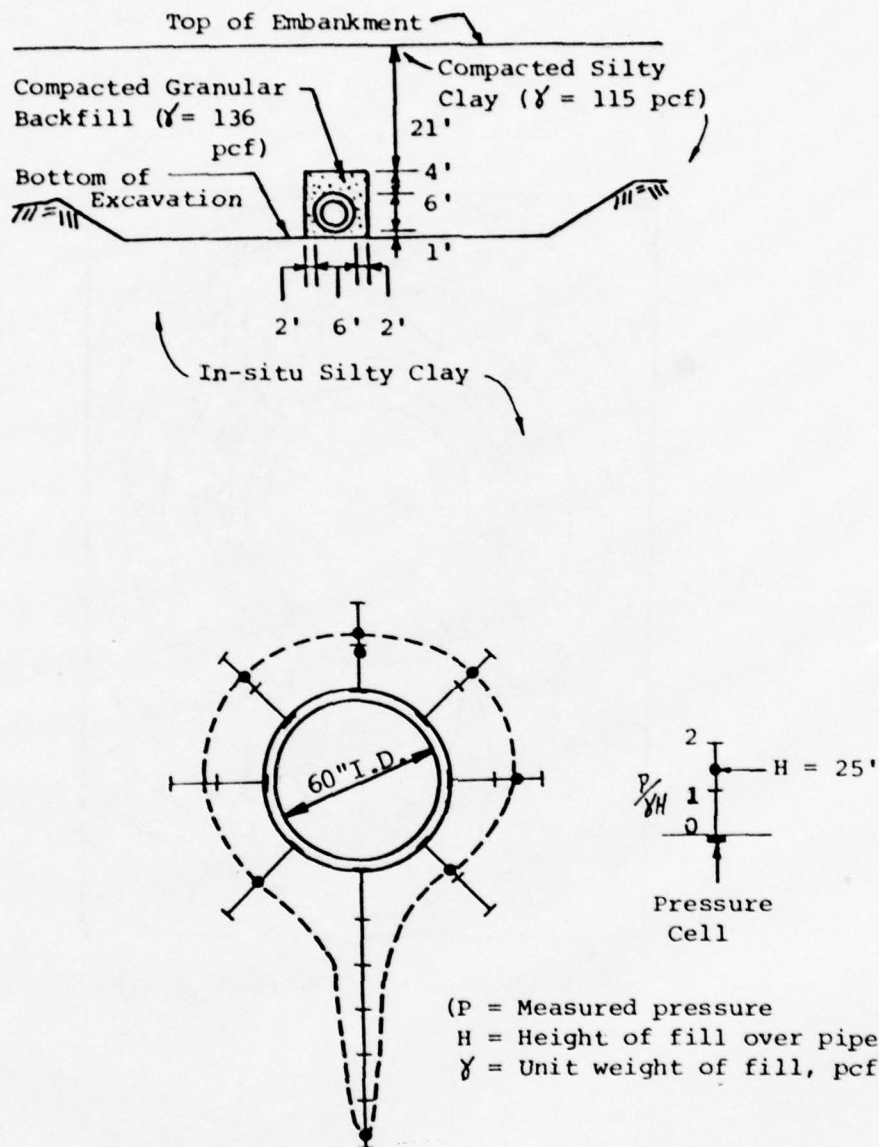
PRESSURE DISTRIBUTION ON 60" I.D. CONCRETE PIPE,
